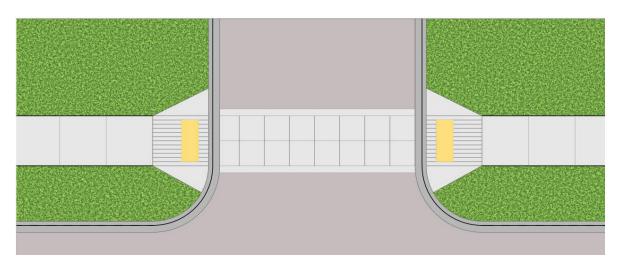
// ALLEYWAY CROSSING OF SEPARATED SIDEWALK WITH DIFFERENT SURFACE TREATMENT
